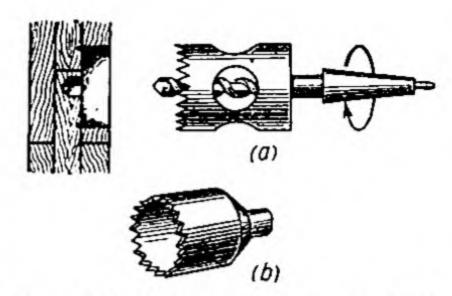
Tools used to cut holes in wooden, brickwork and concrete surfaces for installing junction and outlet boxes:
